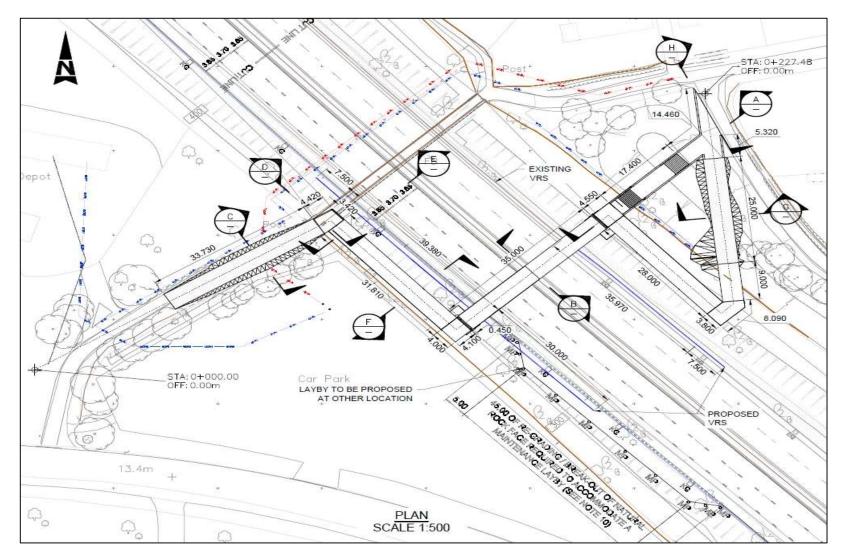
A1260 Nene Parkway Footbridge Preliminary Design
